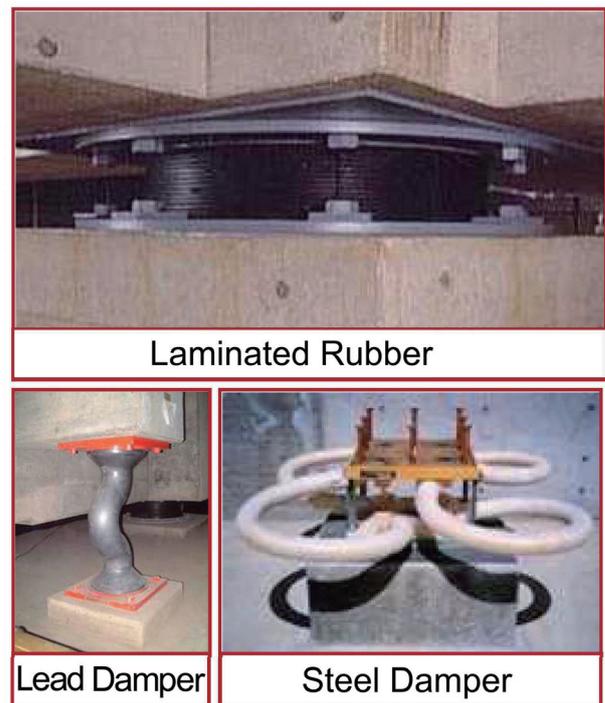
Types of Inter-Floor Dampers. (Provided by S. Sakai)
